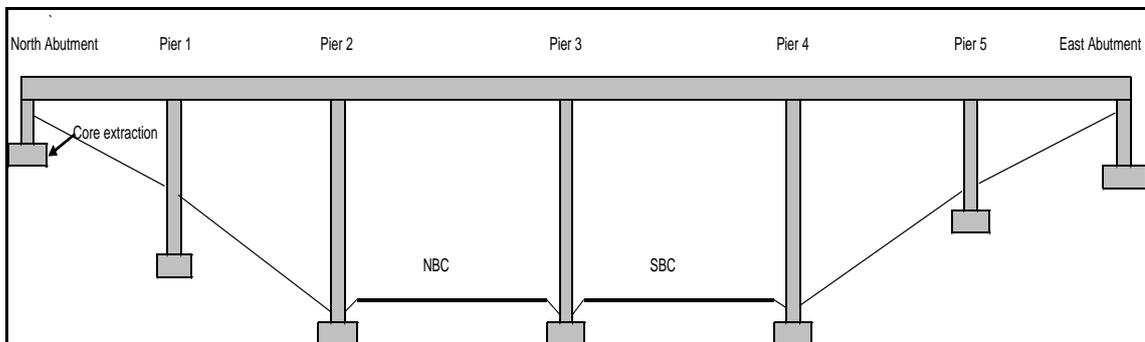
Positions of limited coring undertaken on the N2 Ramp E Bridge
